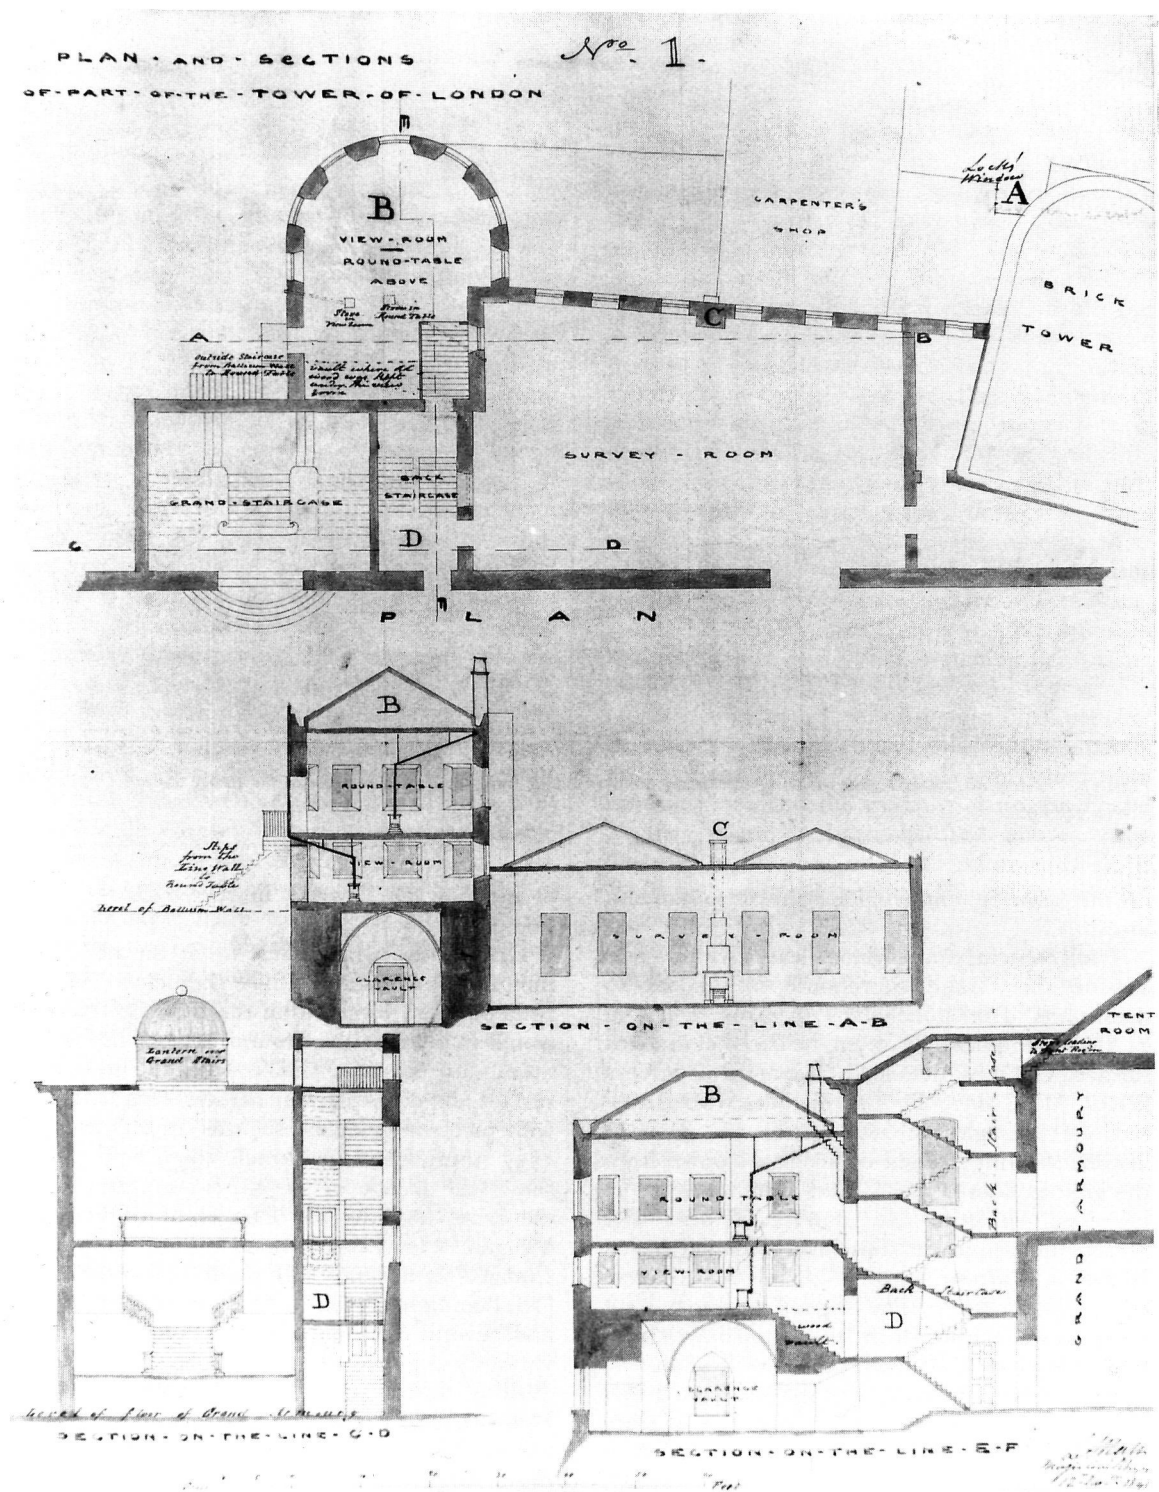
Tower of London: detailed plans and sections of the Grand Storehouse staircase in 1841; original in the Public Record Office, PRO MPH/892
